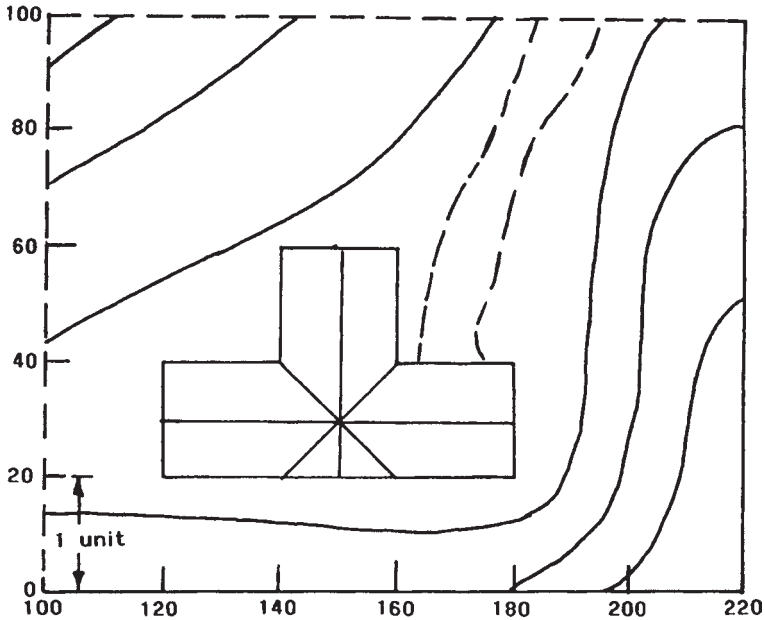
A portion of the plan map in Figure 3.1 drawn to scale 1:20.
